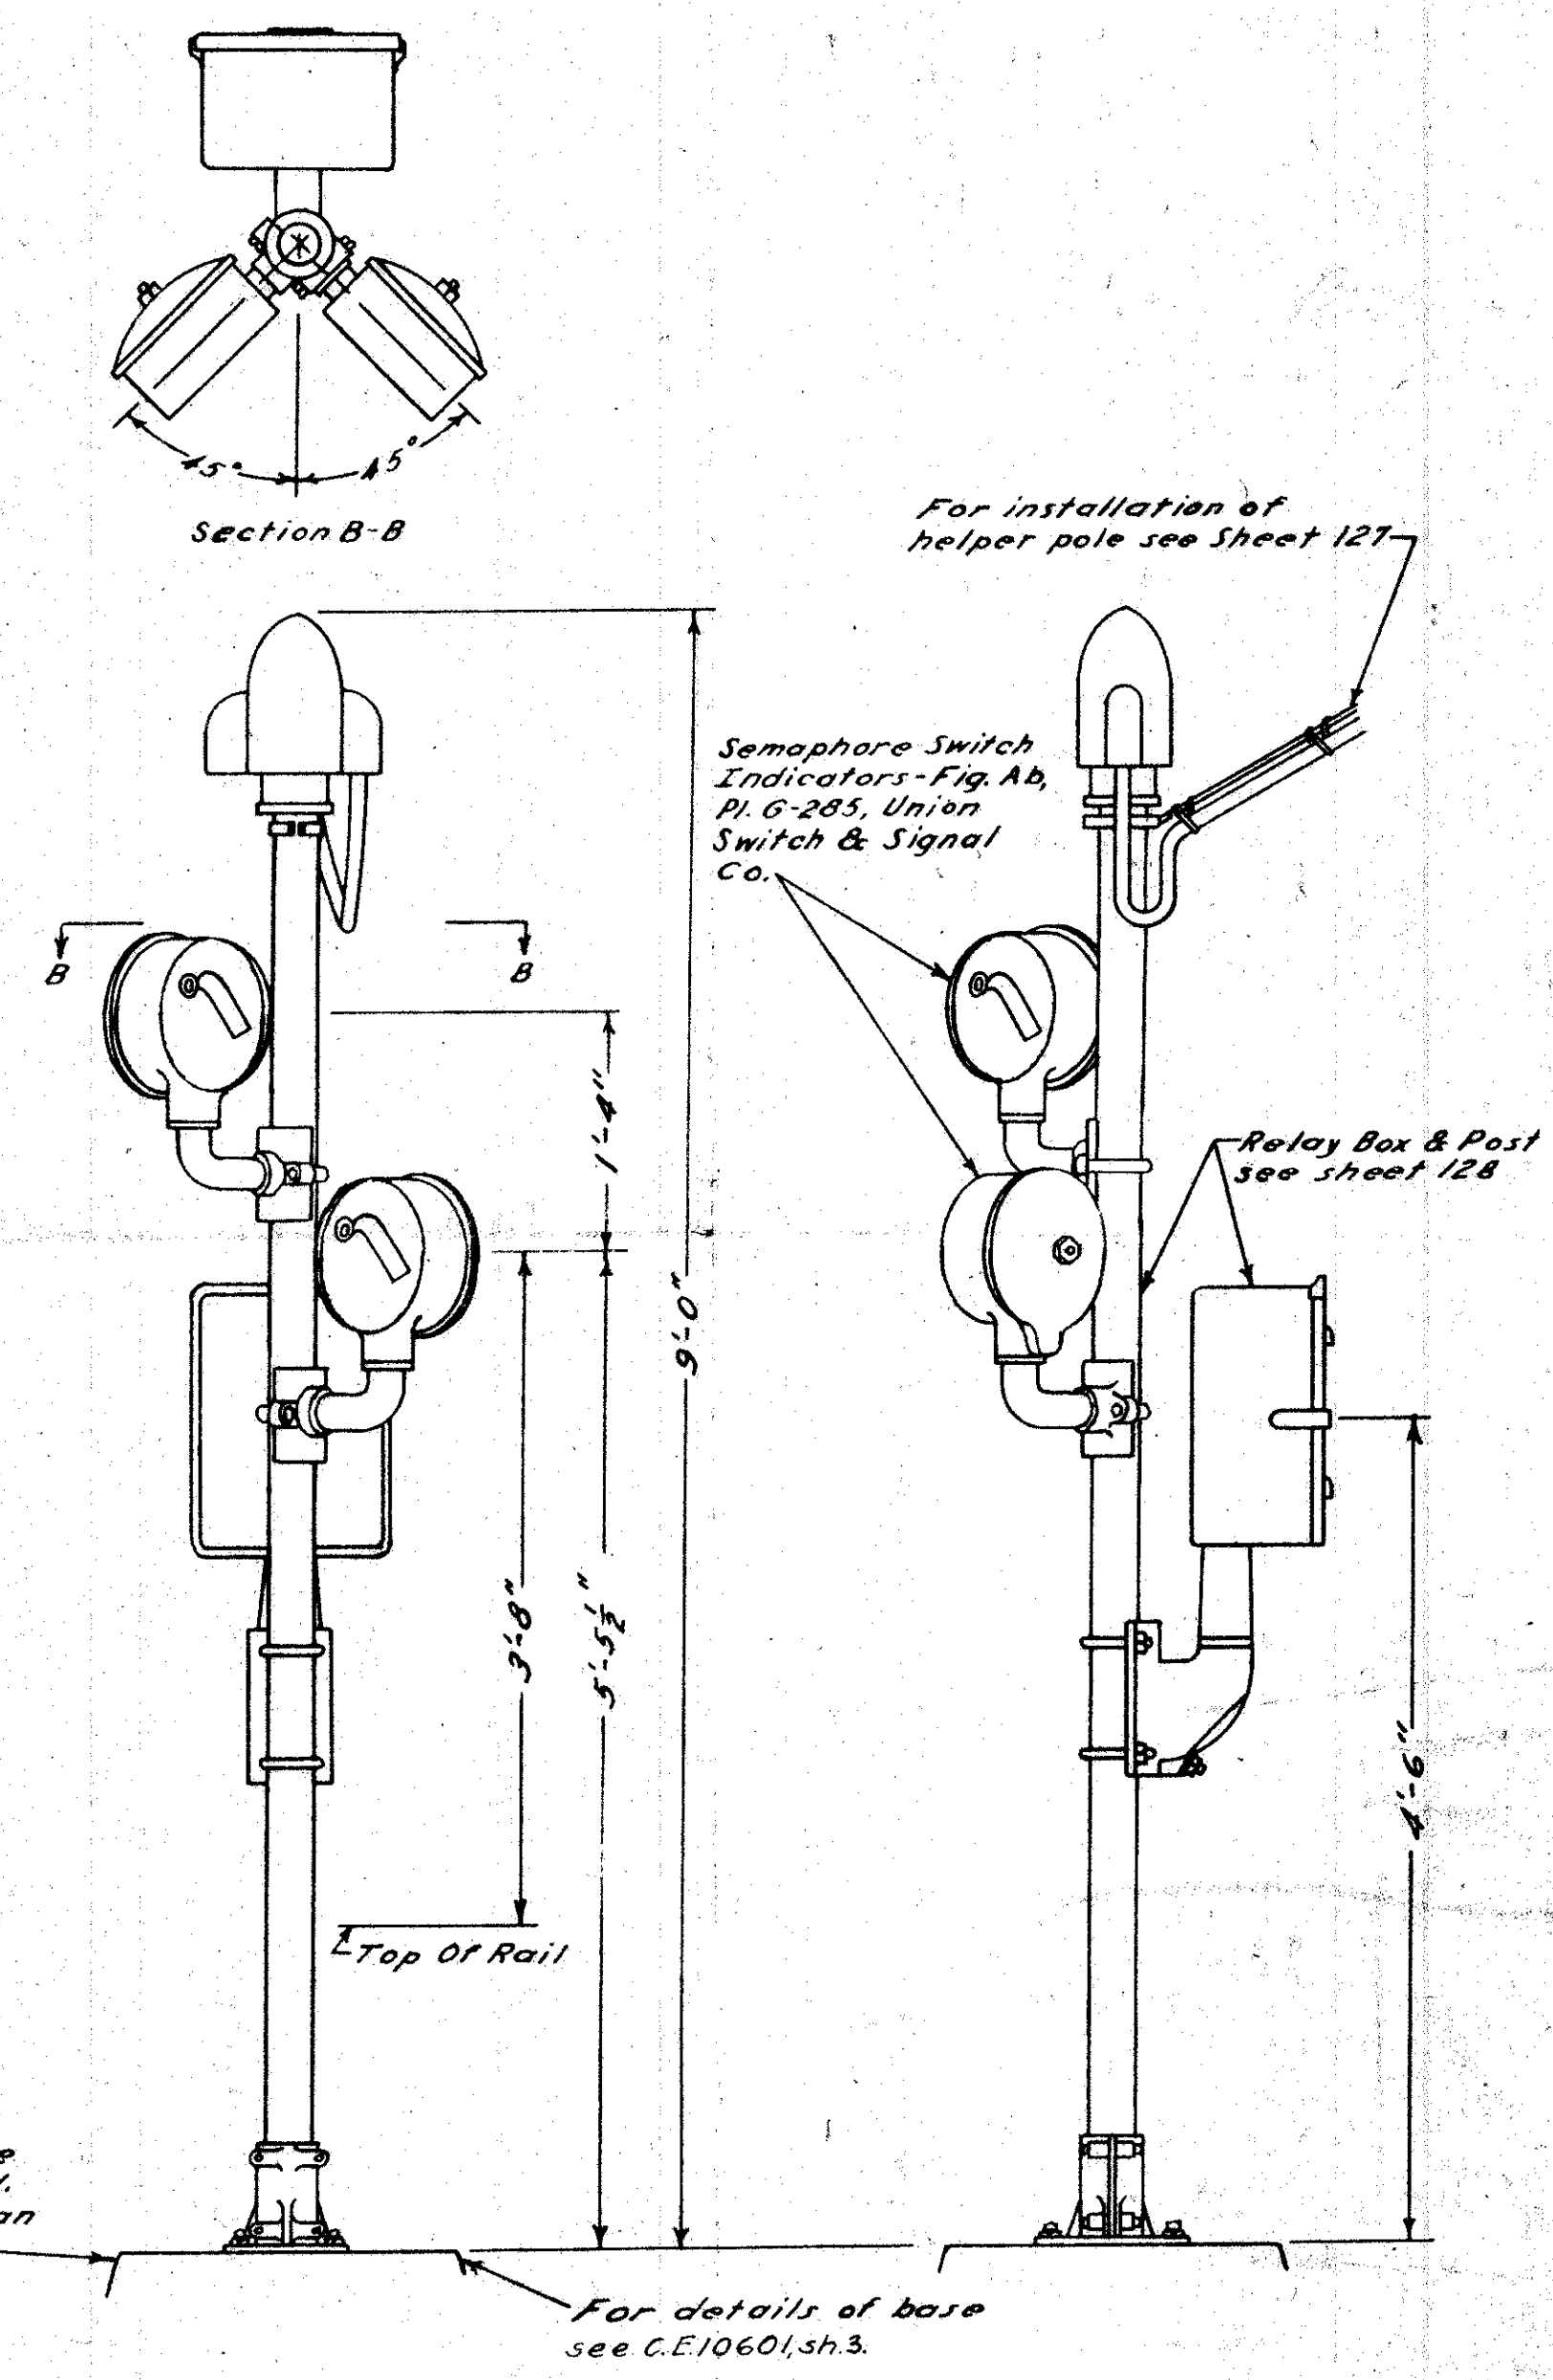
TRACK CAR INDICATORS WITH CABLE POST AND RELAY BOX
